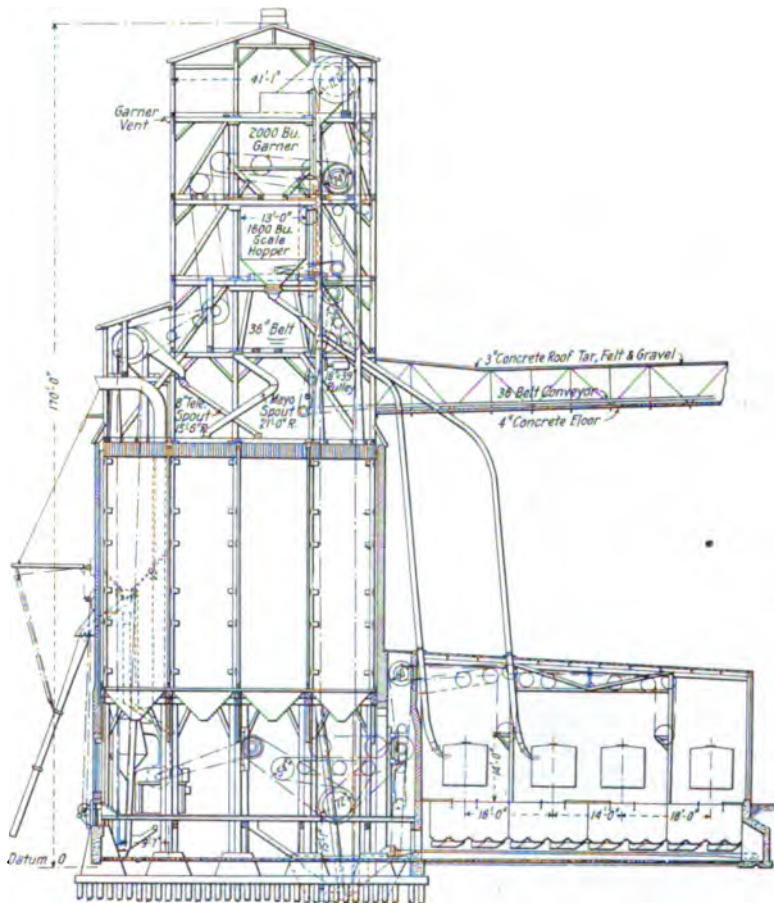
Section of working house, elevator, Chicago—Santa Fe.
